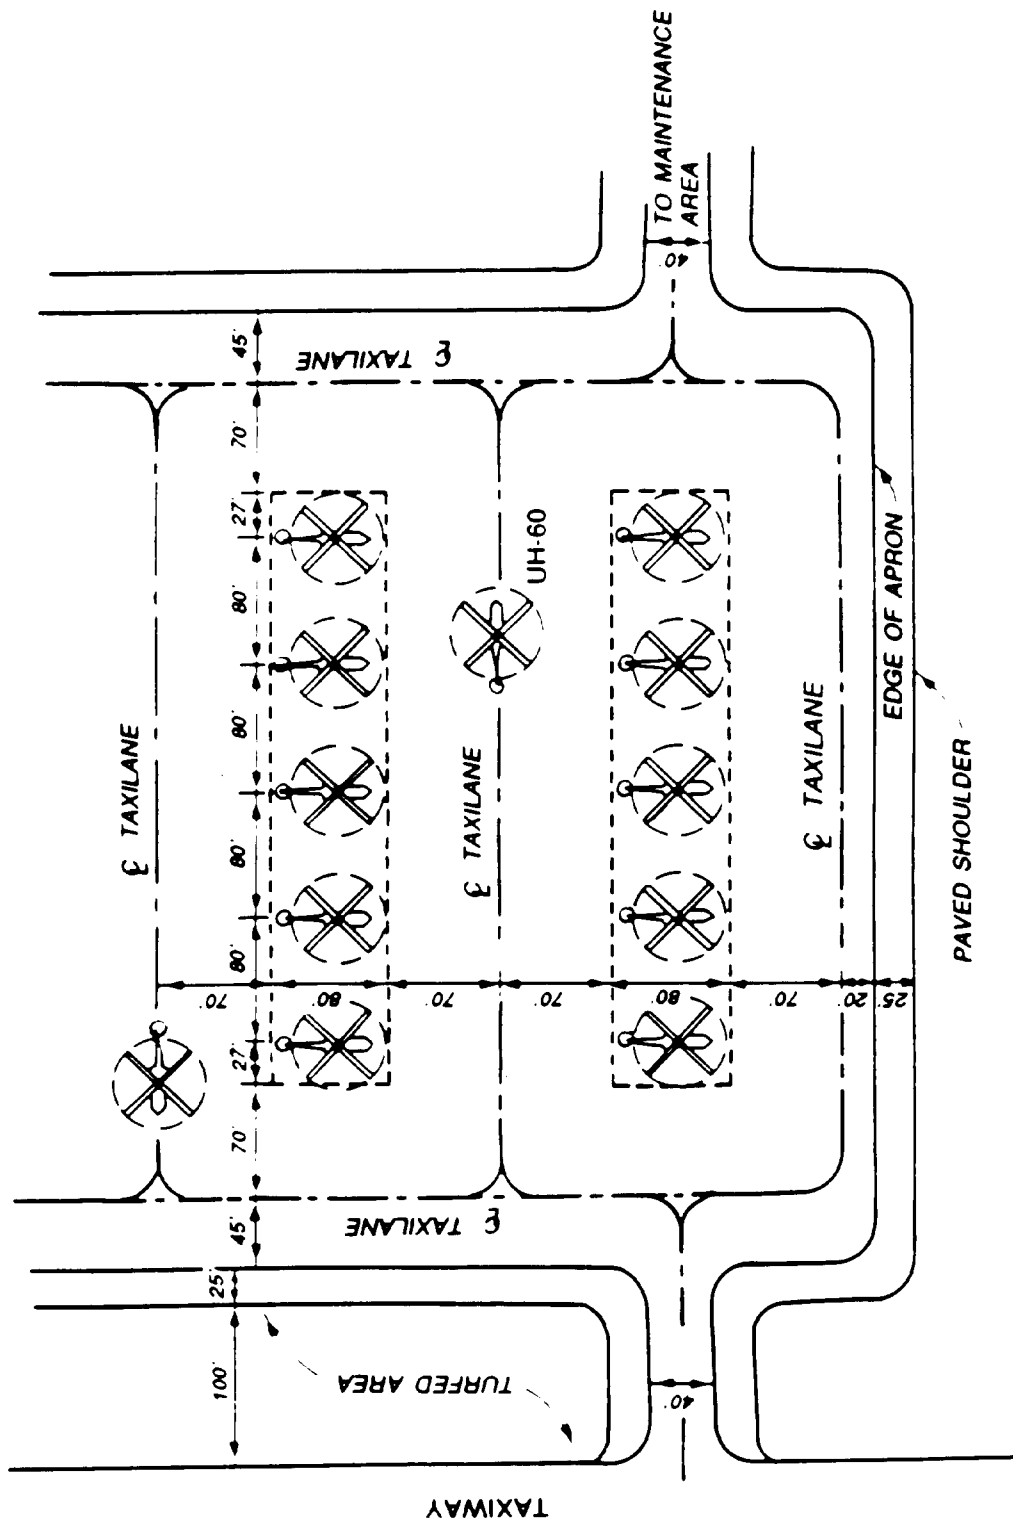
UH-60 Parking Plan, Type 1 (Single Lane)
